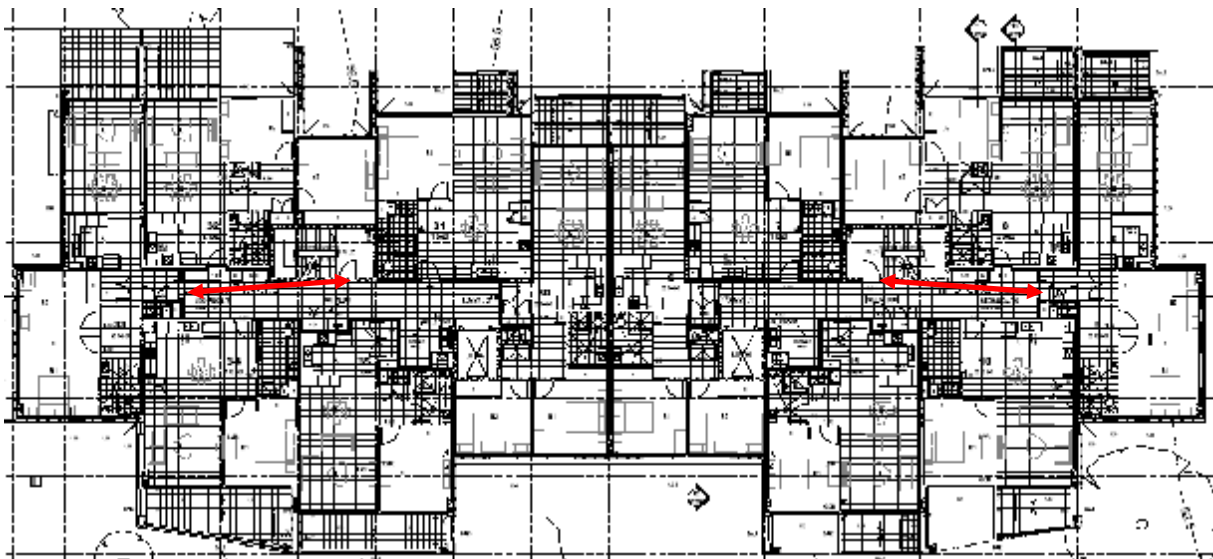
Maximum travel distances from units (1-5 Shortland Street, building A2 shown)
